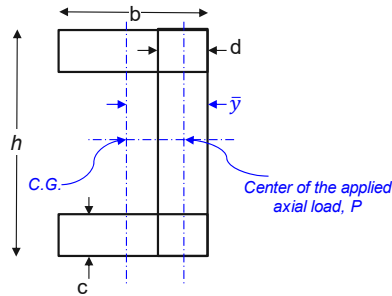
Location of centroid and centerline of axial load for C-Shaped wall specimens
